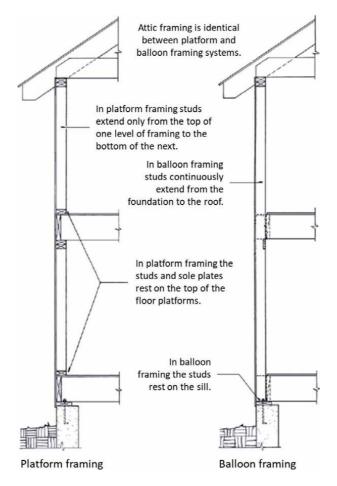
Light frame construction methods: platform framing and balloon framing (modified from [25]).
